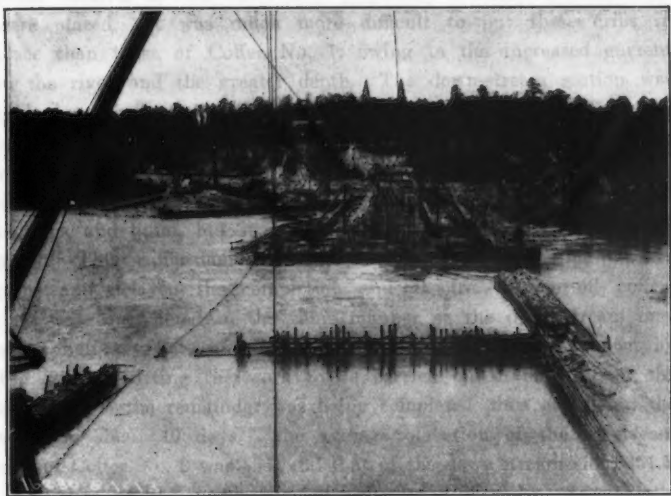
SECOND COFFER-DAM, SHOWING CONSTRUCTION OF LIGHT PARTITION RIBS UNDER WAY.
